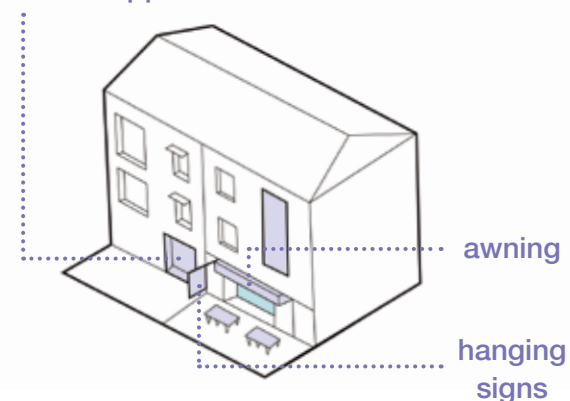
Hanging signs, shop awnings and occupation of pavement with chairs are acceptable.
